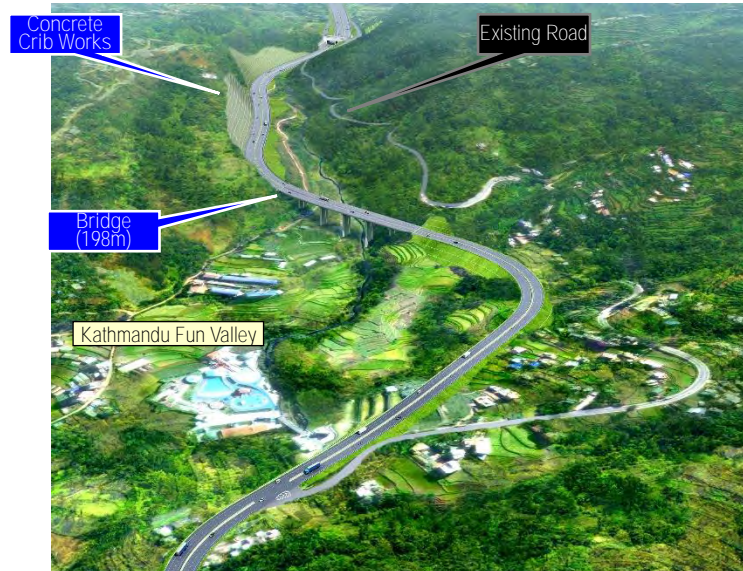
Proposed Bypass at Sanga (Previous Survey)
